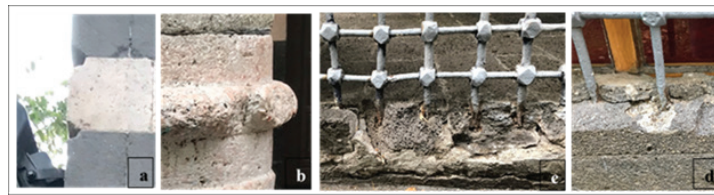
Missing Parts a. North Façade Wall b. Column Bracelet on the North Façade c. Mausoleum Wall on the East Façade d. East Façade Window
